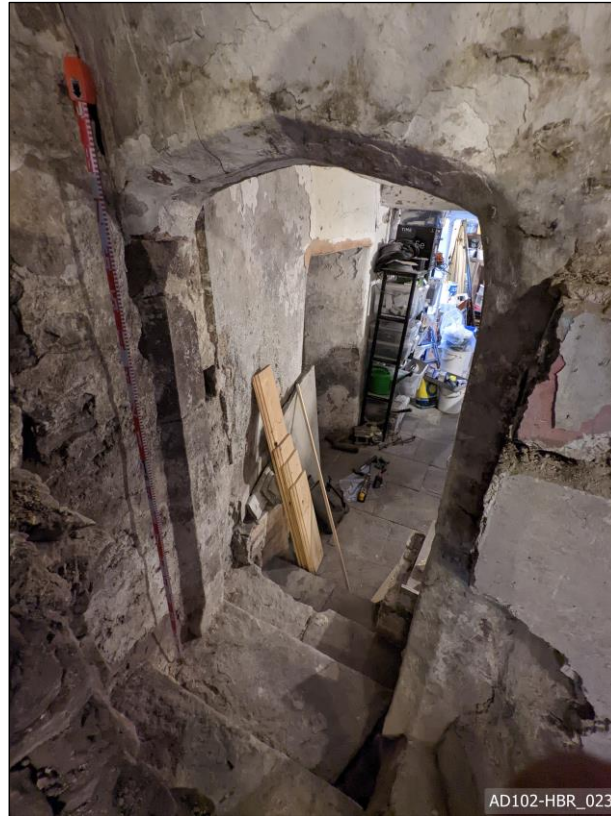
Doorway B – View south-west, showing north-east elevation of unblocked doorway.
